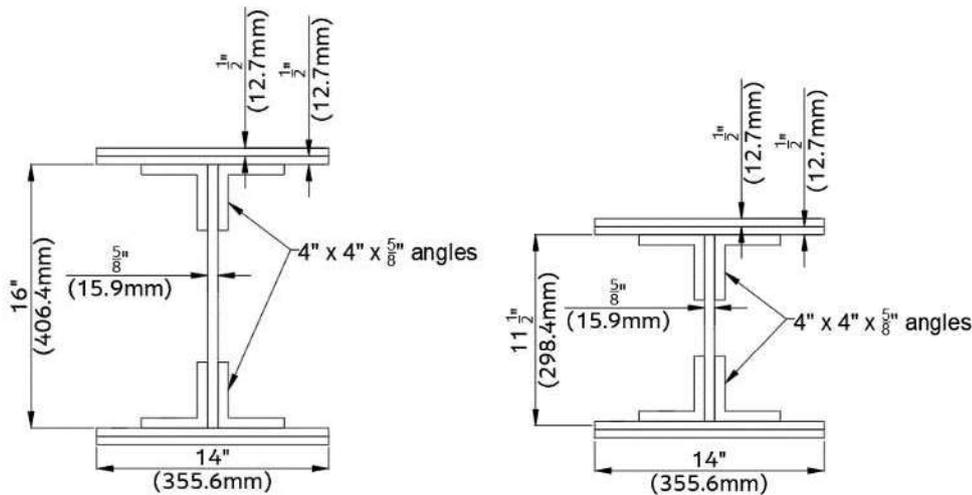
Girders 21 and 34 cross sections (midspan left, support right)
